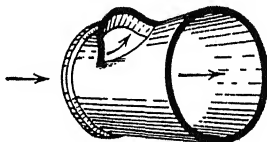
Typical outlet pipe, Deer Island outfall.
